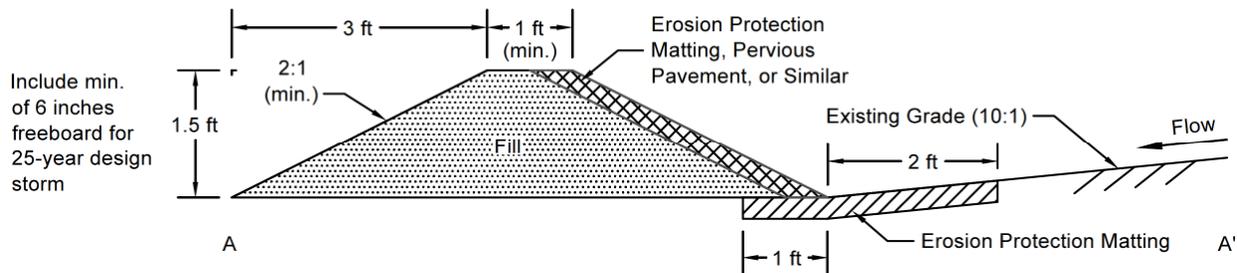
Proposed Diversion Berm Concept Design Cross Section
